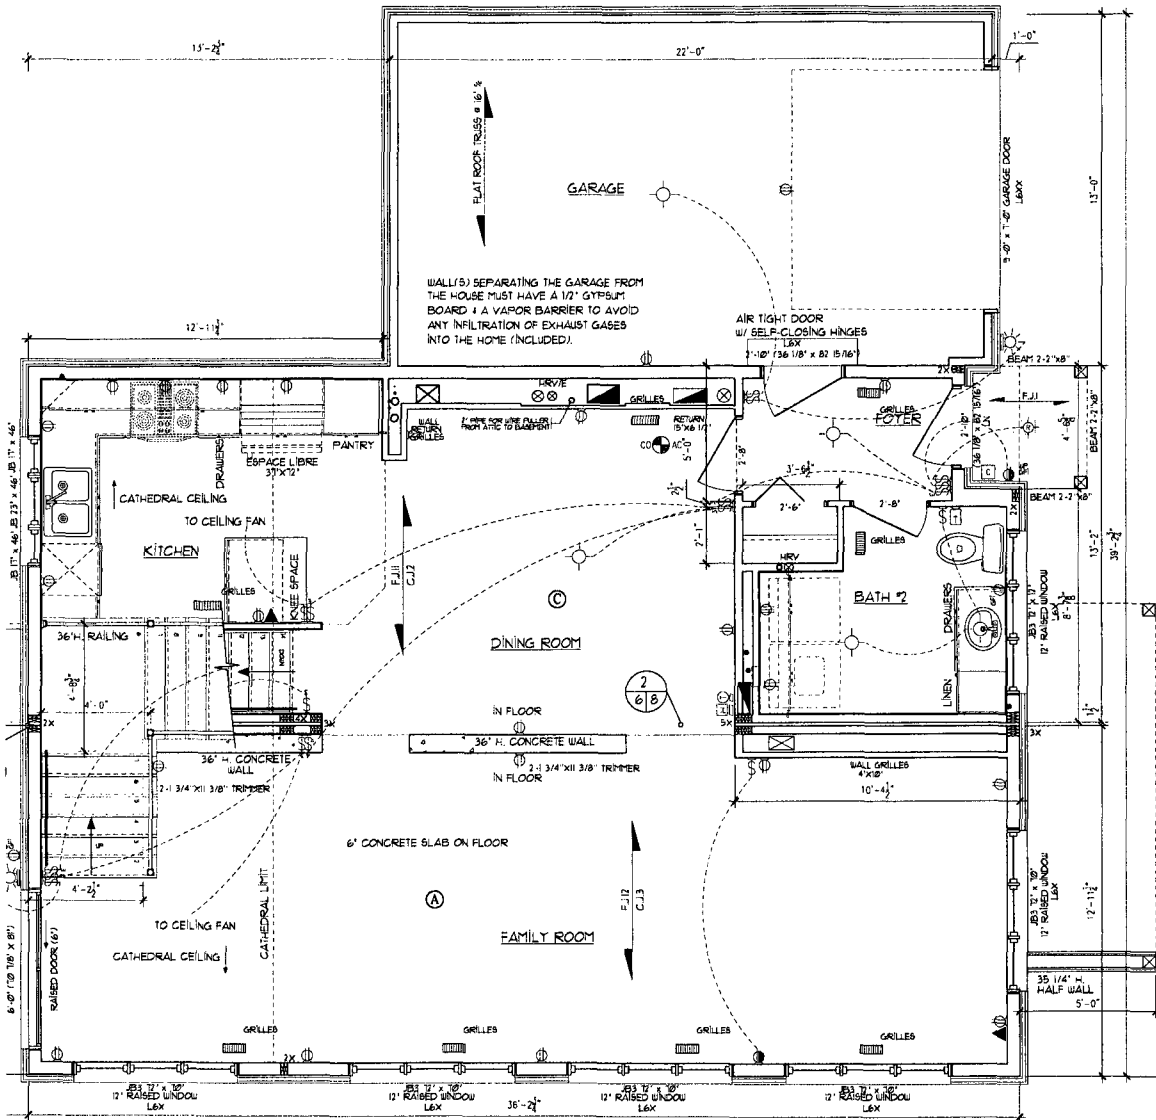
Ground floor plan (courtesy of Alouette Homes)
